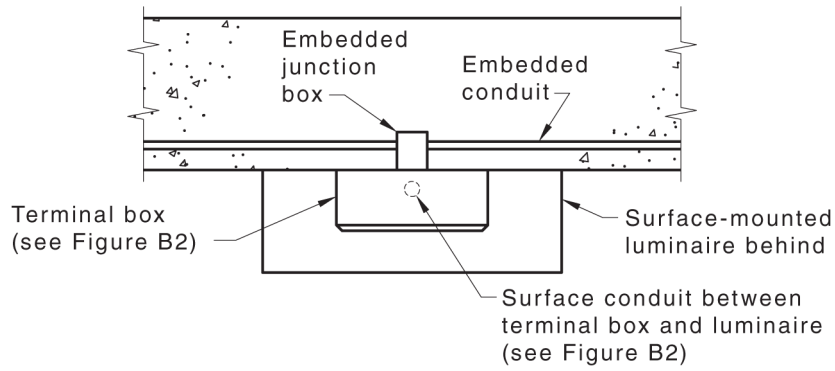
TYPICAL LAYOUT OF EMBEDDED CONDUIT, SURFACE-MOUNTED TERMINAL BOX AND SURFACE-MOUNTED LUMINAIRE
